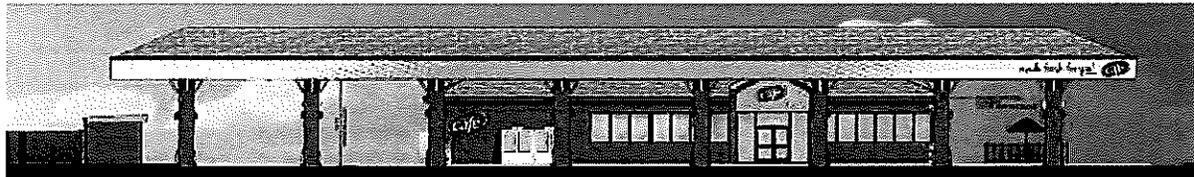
Front Elevation of Proposed Van Buren Speedway Development
